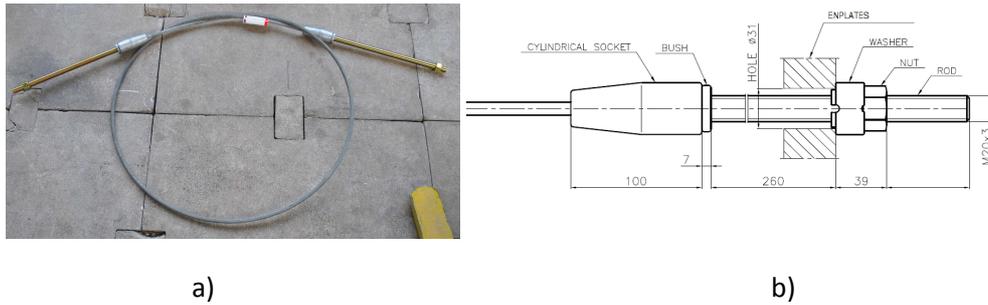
a) Prestressing Cables and b) cylindrical socket detail
